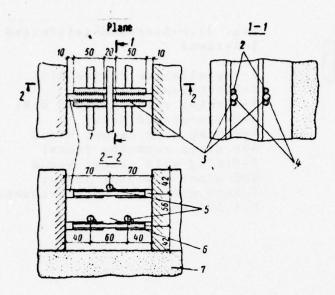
Connection of the slabs according to the type "reinforcing beam"
